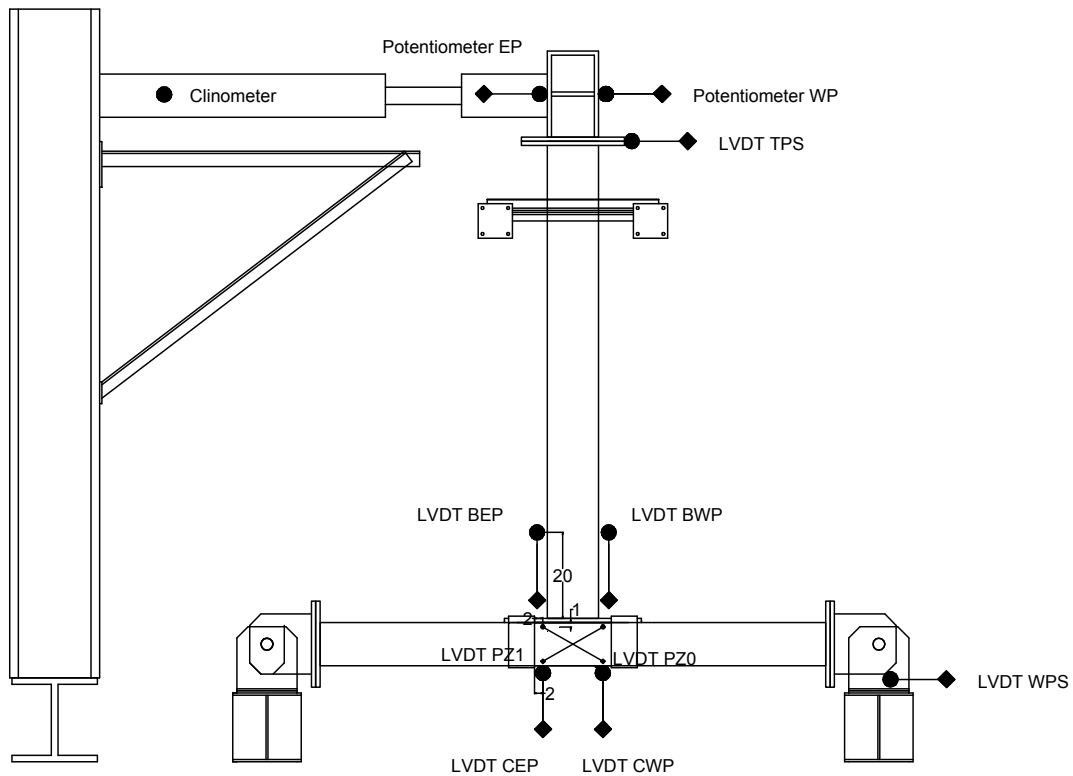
Layout of Instrumentation Primarily Used for Secondary Measurements for the Connection without Stiffeners (units in inch)
